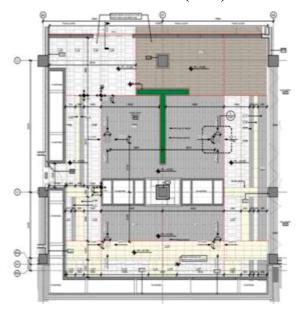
Food Court Terrace Ceiling Plan Mall of Oman (BIM)
